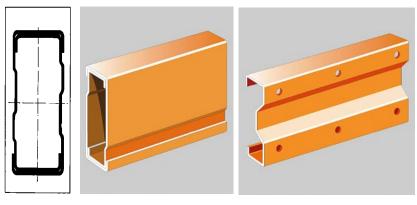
Typical pallet rack beam cross-sections: 'boxed', nested C-beams (left) or sigma (Σ) beams (right) for automated operation with S/R machines
